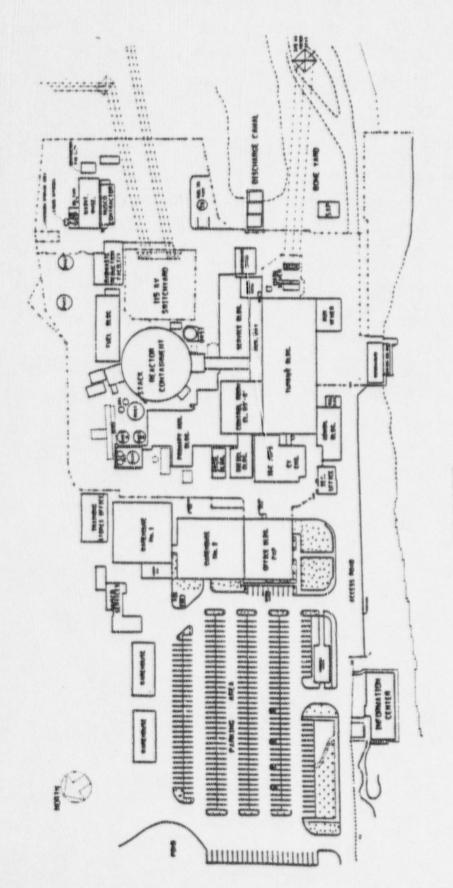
CONNECTICUT YANKEE SITE PLAN
